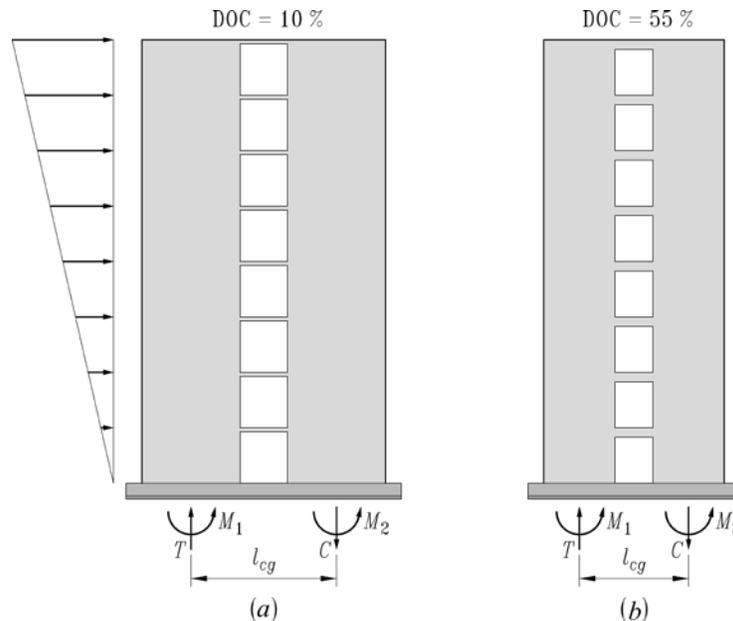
Geometry of wall systems (a) weakly coupled, (b) moderately coupled.
